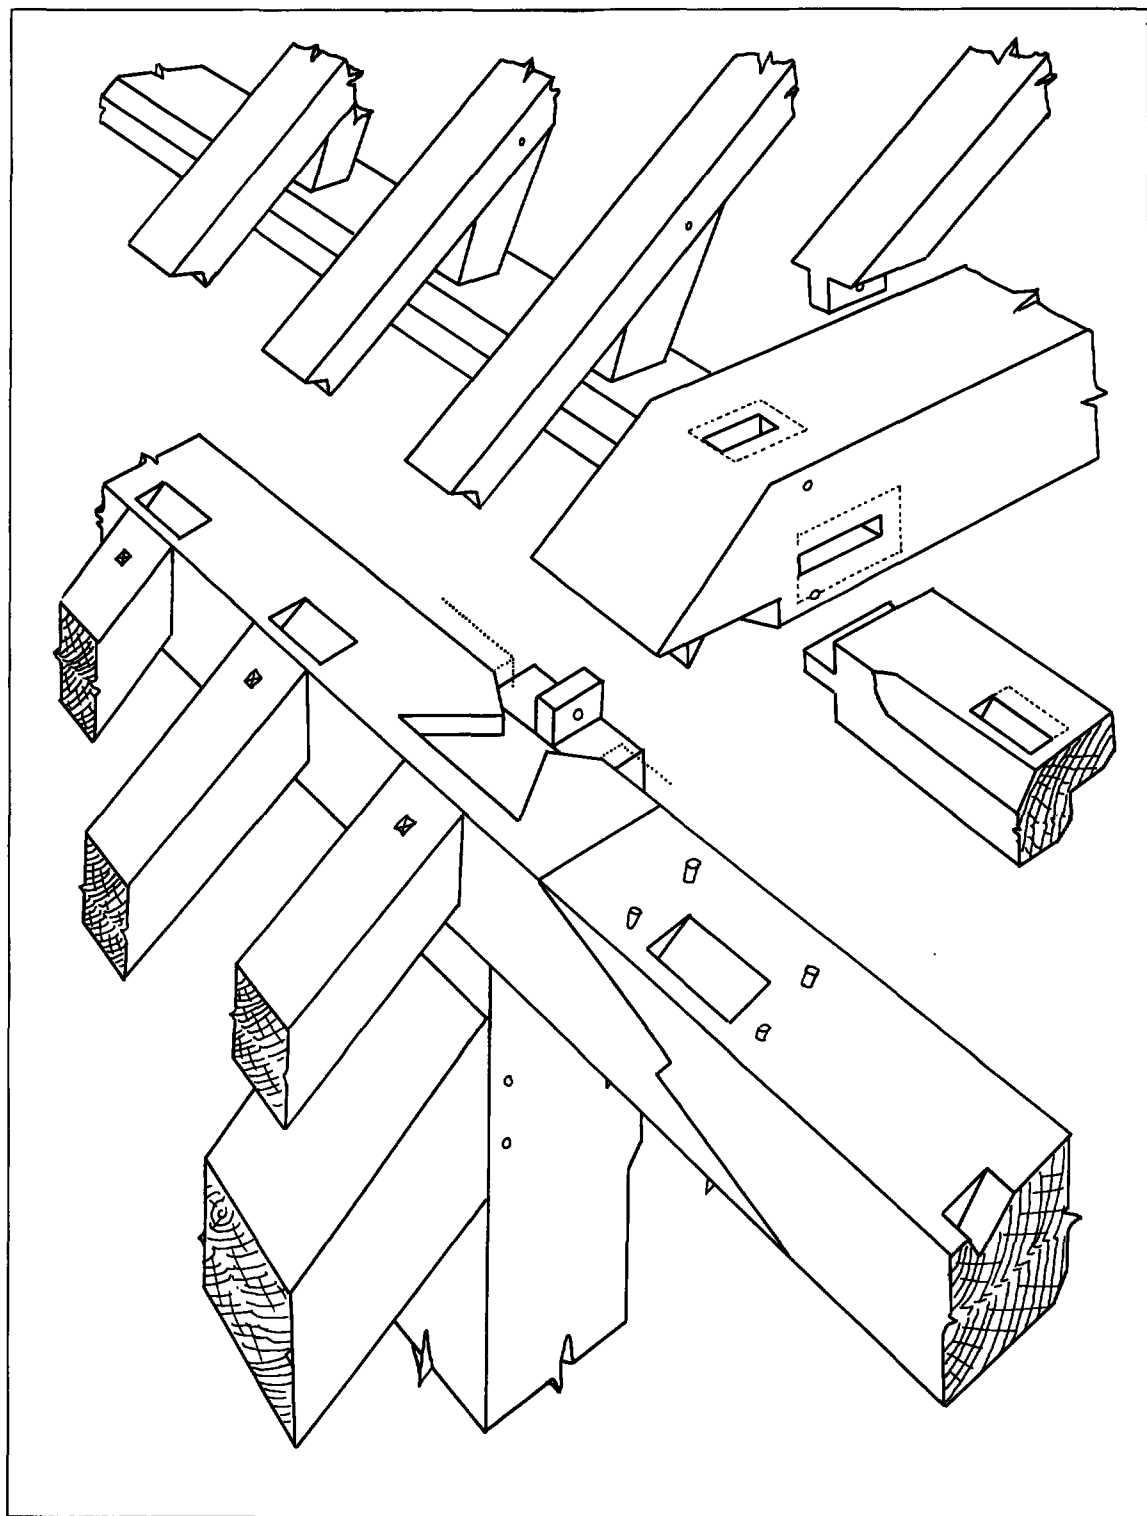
Pilgrims' Hall, Winchester. Lap dovetail joint and rafter assembly at west end of truss III.
